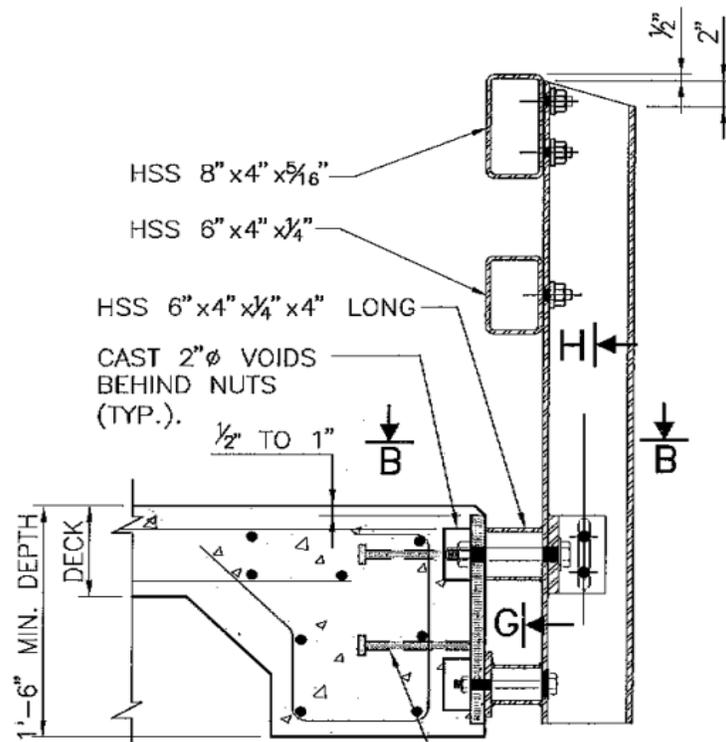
Side-mounted metal bridge railing (New Mexico).
